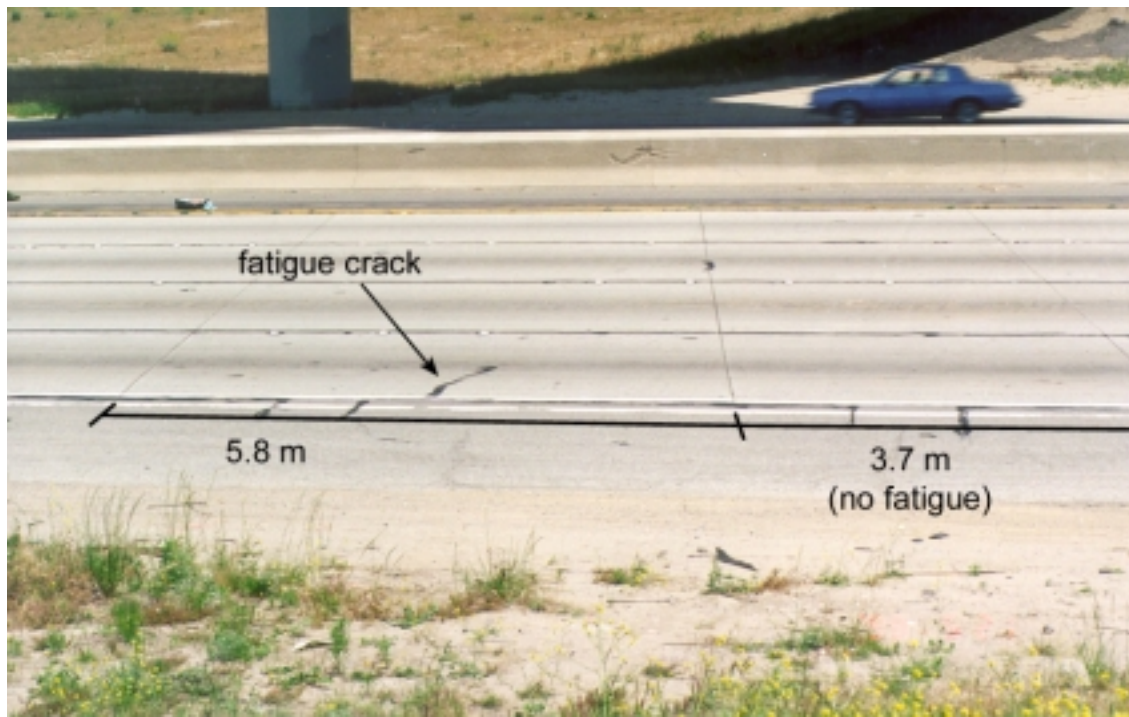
Pavement distress at postmile 9.6 eastbound, Interstate 10, San Bernardino county: transverse fatigue cracking in long slab, none in short slab.
